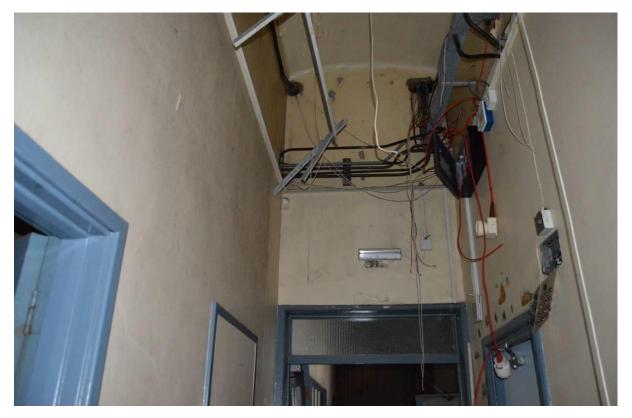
View of the barrel vaulted ceiling, an original feature of the ward lobby (facing south east).
